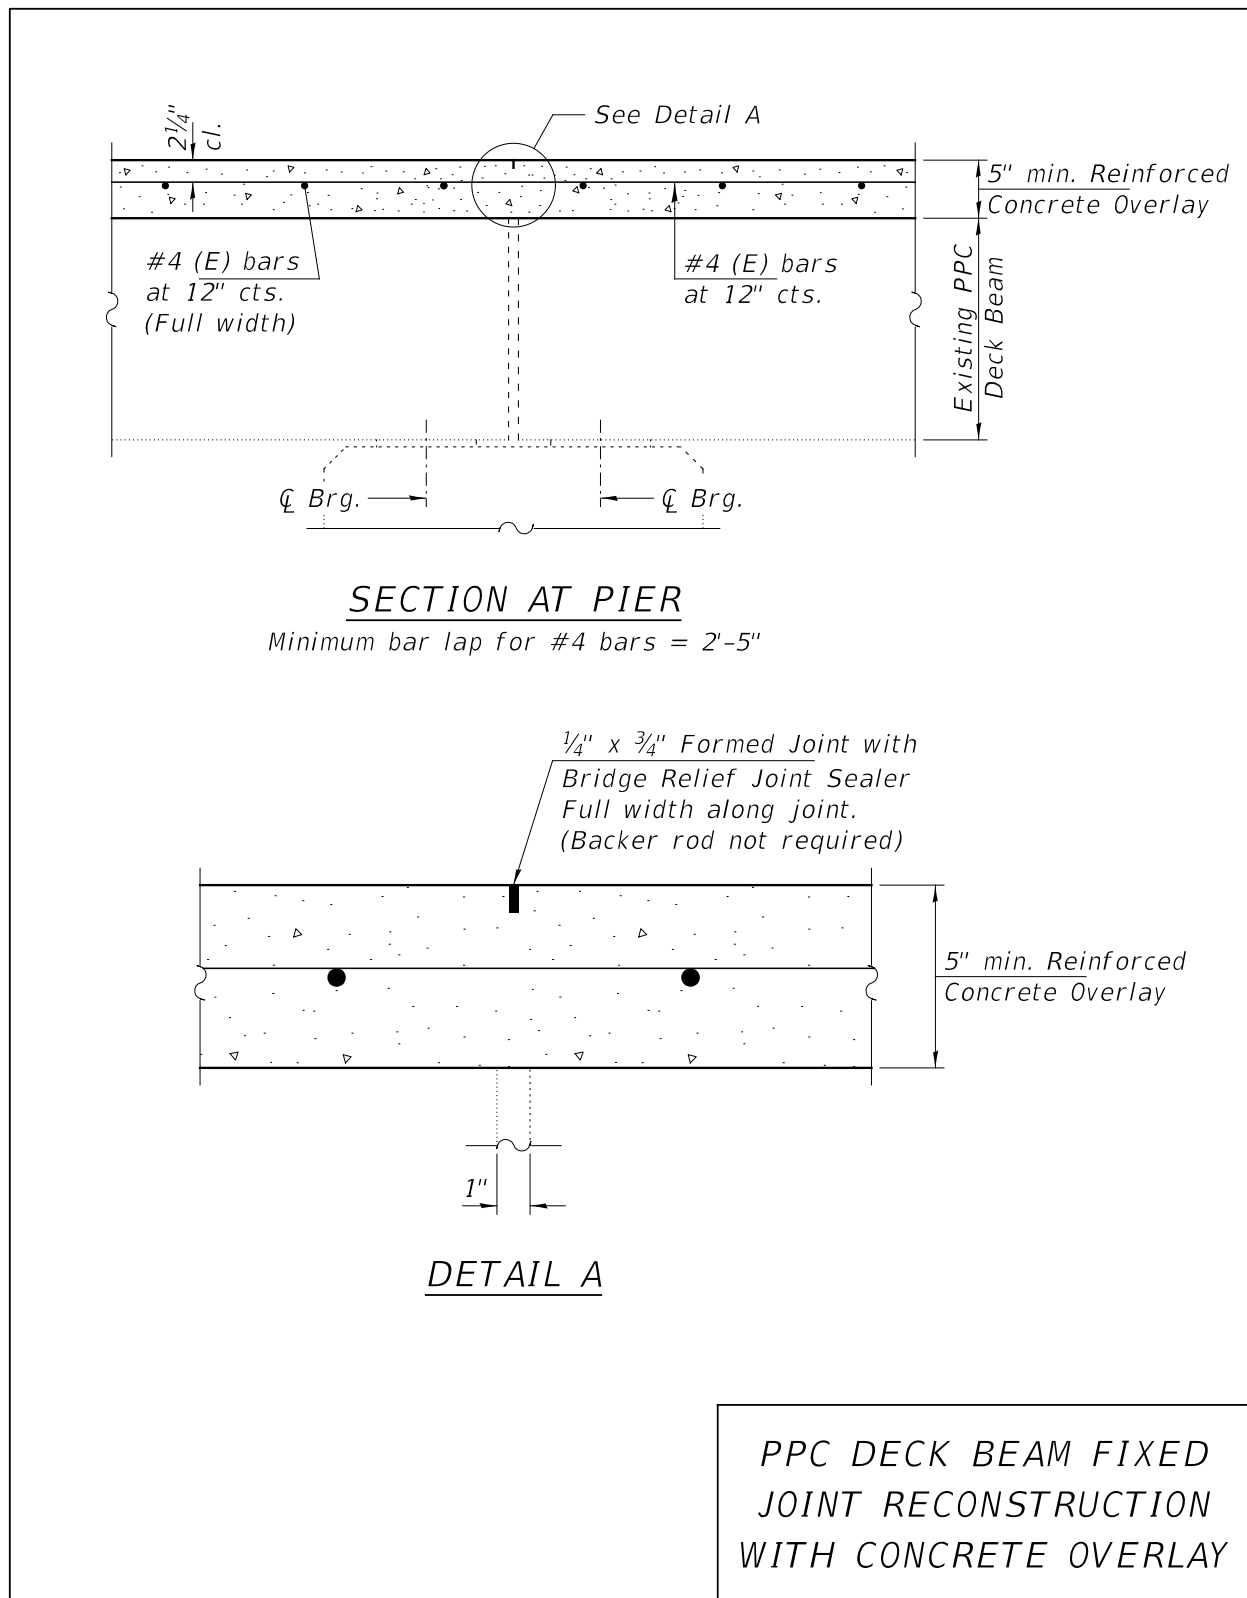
PPC Deck Beam Fixed Joint Reconstruction with Concrete Overlay
